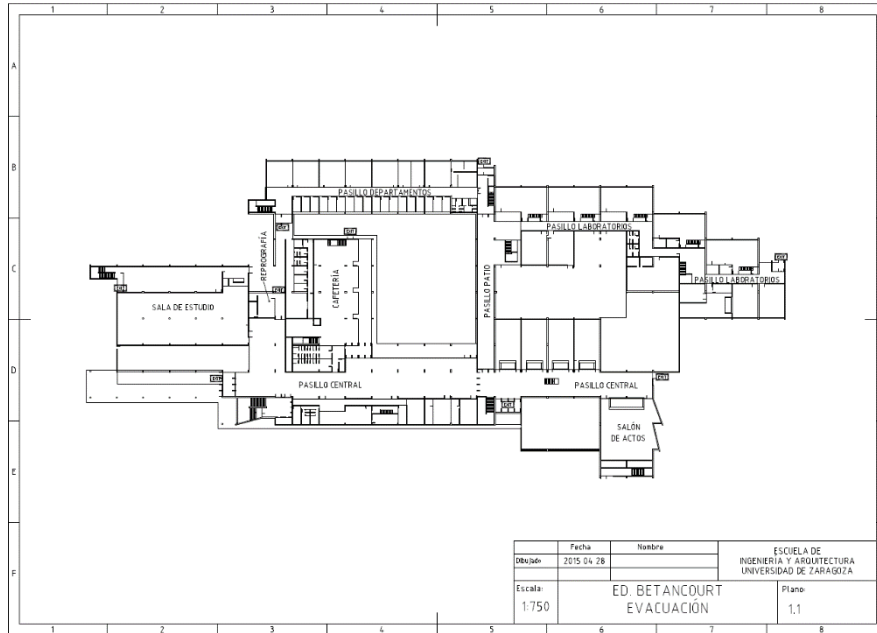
Ground floor plan of the Agustín de Betancourt building
